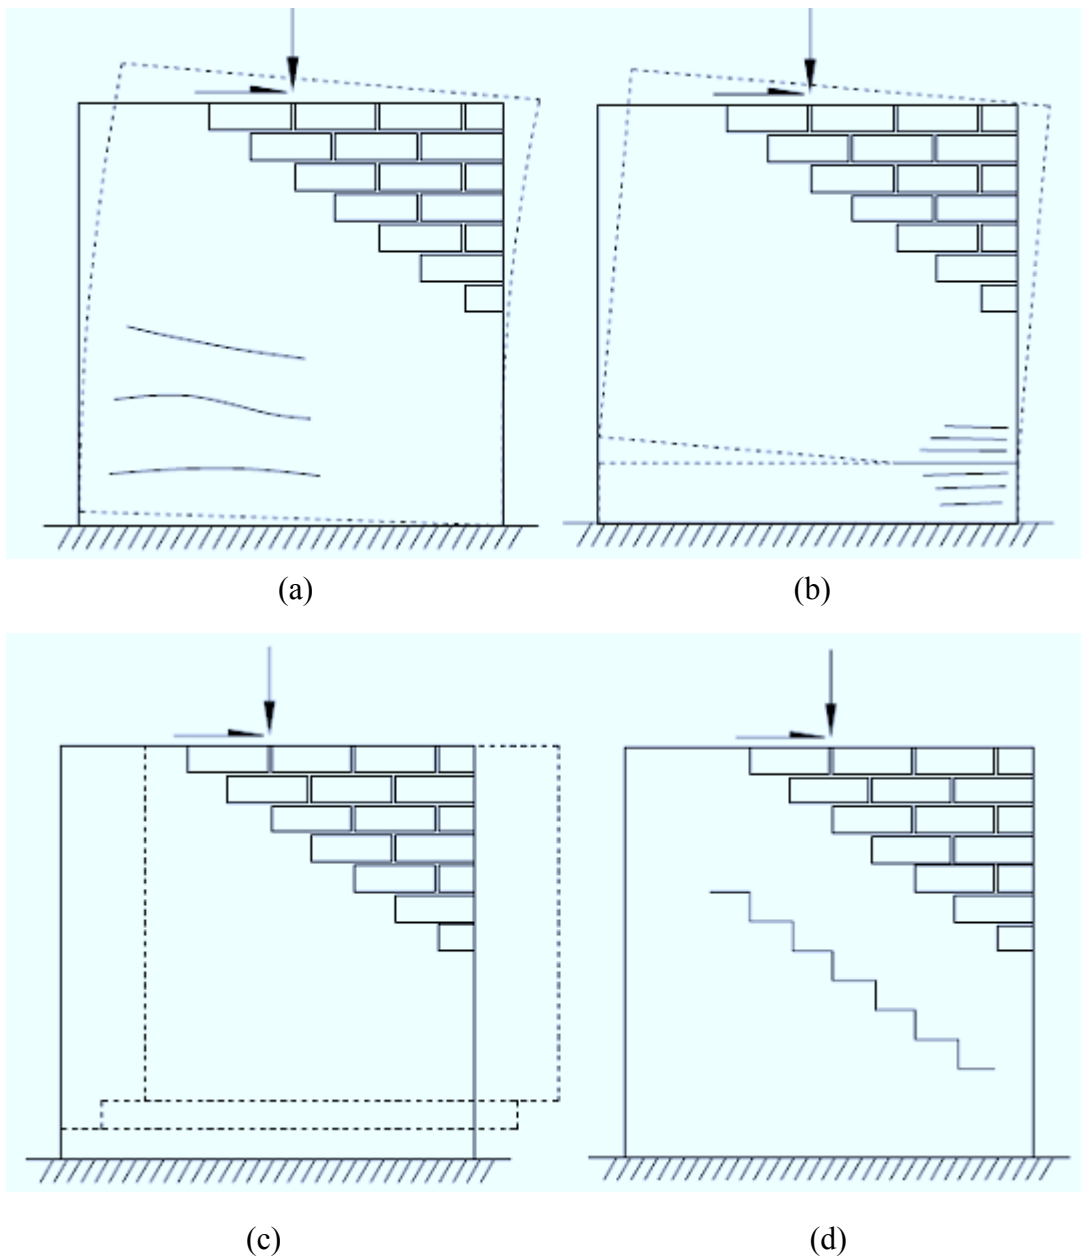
Failure patterns for in-plane loaded masonry walls: (a) Flexure, (b) Rocking, (c) Sliding, (d) Diagonal shear.
